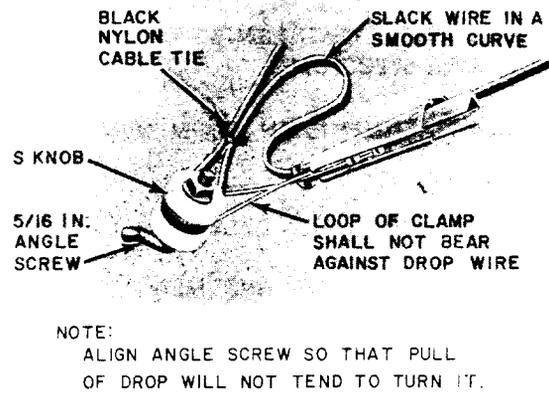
First Attachment—Angle Screw Drop Wire Run in Horizontal Direction on Building (Right)
